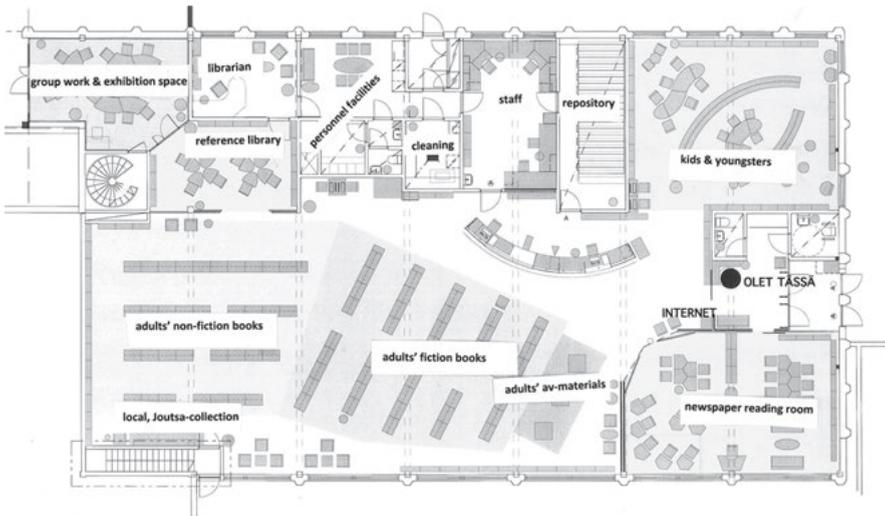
The floor plan for the new library. © Joutsu Municipal Library.
